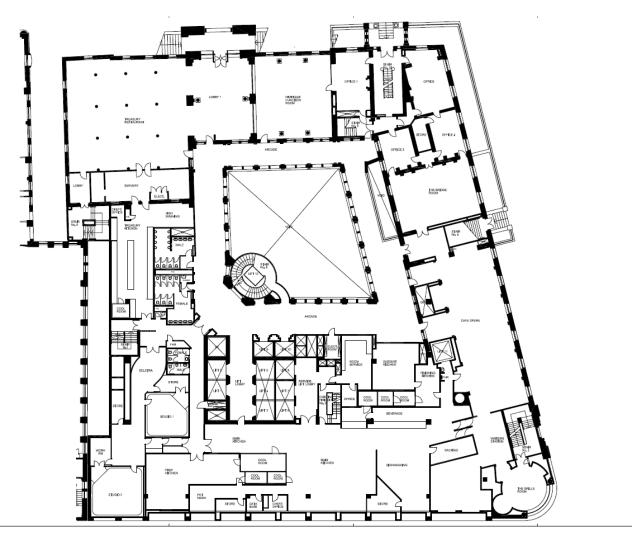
Extract of accommodation survey from 2004: Ground Floor Plan
